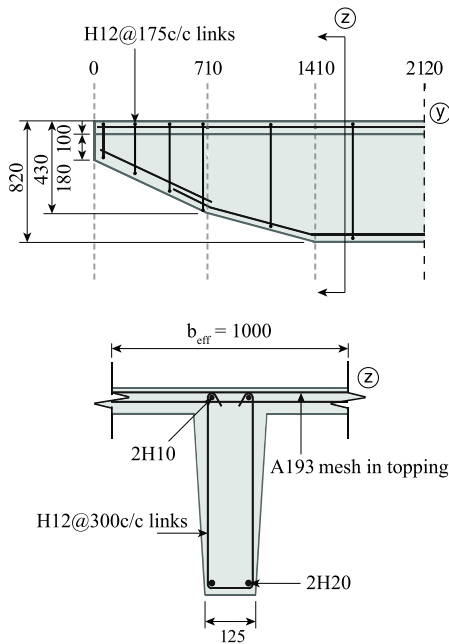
Single bay slab: sample optimized design, showing longitudinal and cross-section of most heavily loaded T-beam in the simply supported slab. All dimensions in mm.
